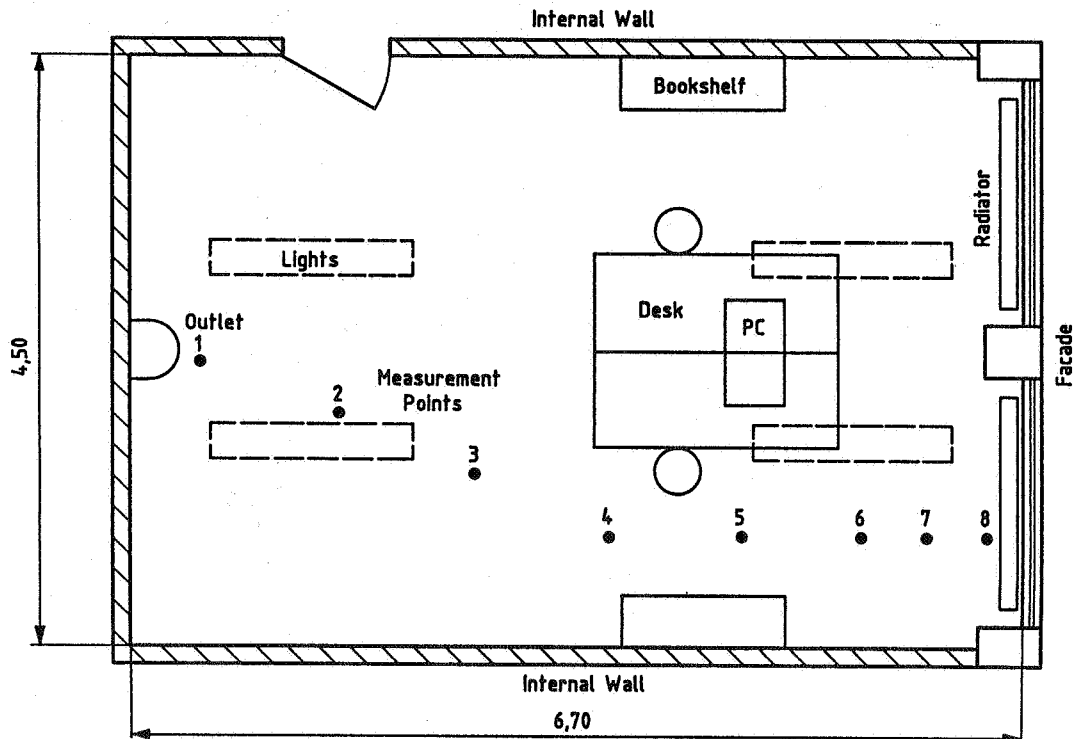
Floor plan of the test room with furniture and location of the internal loads. In addition the measurement points for the temperatures and air velocities are indicated.
